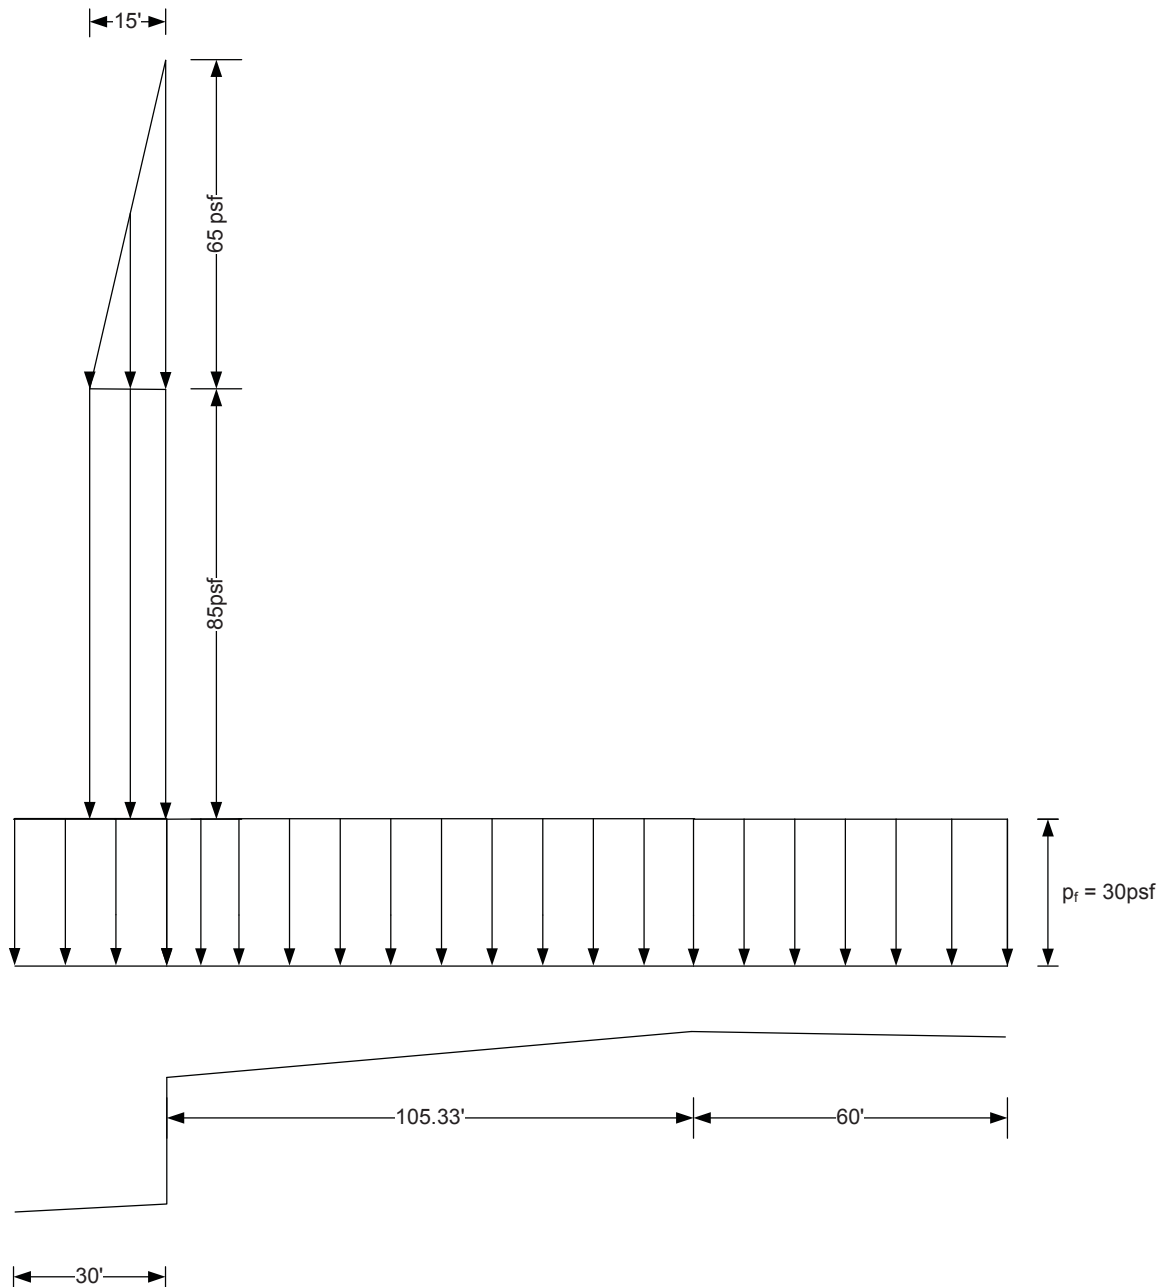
Case 1: Flat Roof Snow Load
